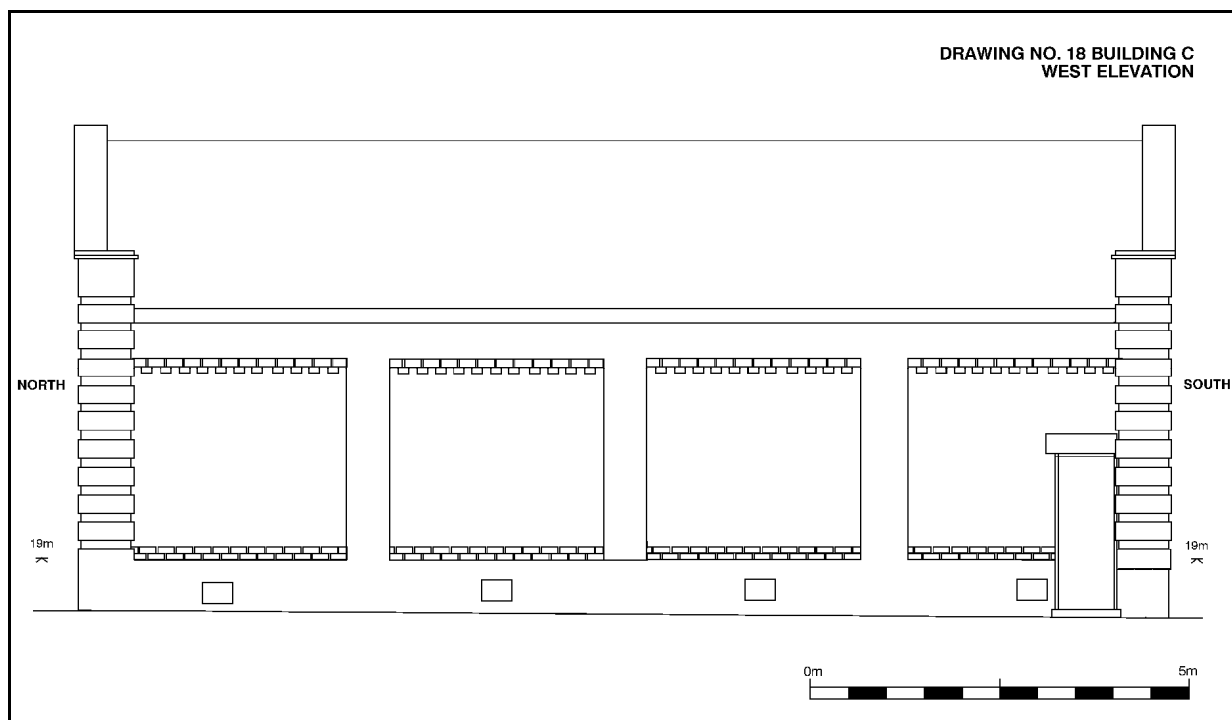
Survey drawing of the west elevation of Building C (scale 1:100)
